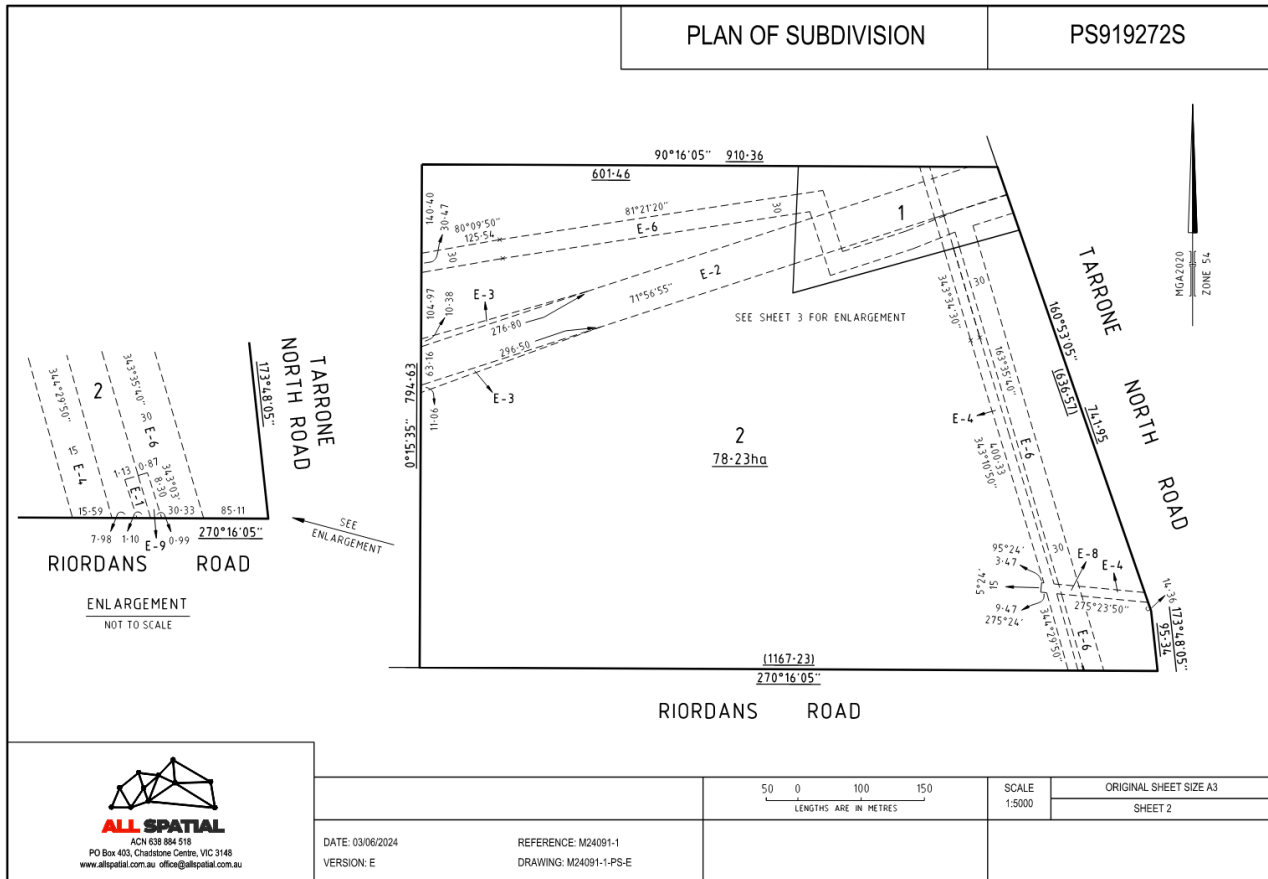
Proposed Subdivision (Source: VicPlan)
